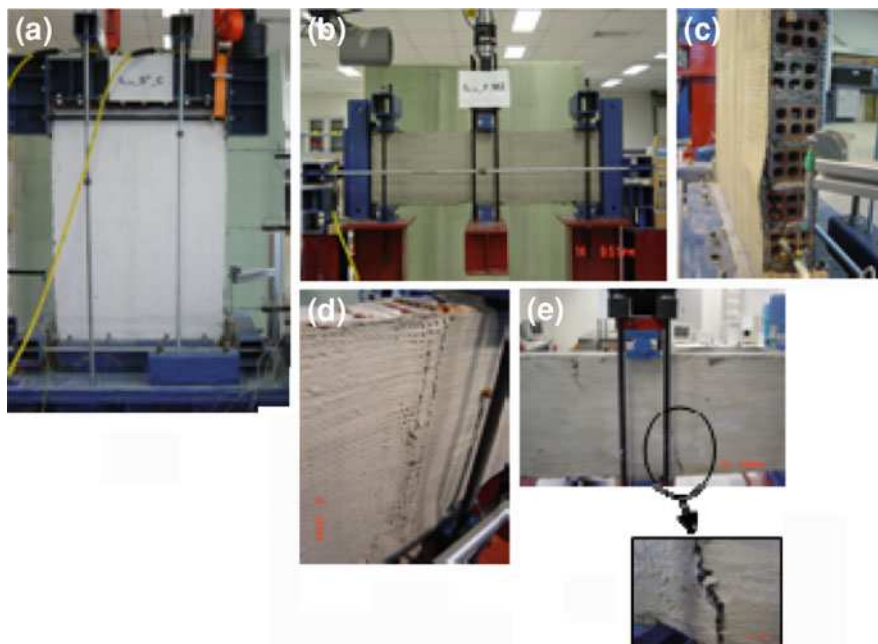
Experimental setup of: a Type A walls and b Type B and C walls; c buckling of TRM jacket at the base of a shear wall; d flexural cracking in TRM jacket of type B wall; and e extensive debonding of the TRM jacket from the type C wall surface
